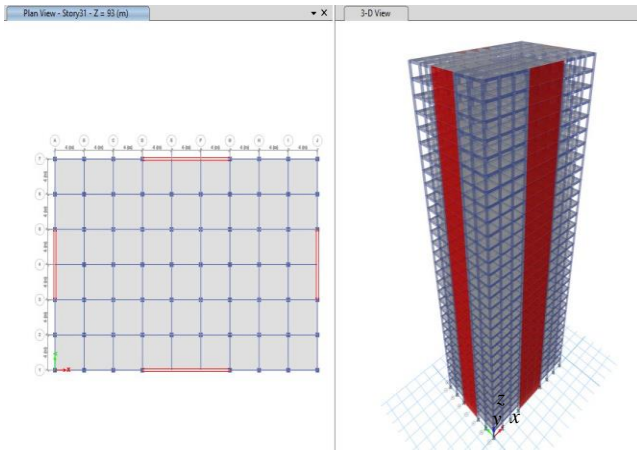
Model 5-Buildings with shear wall located at all four edges
